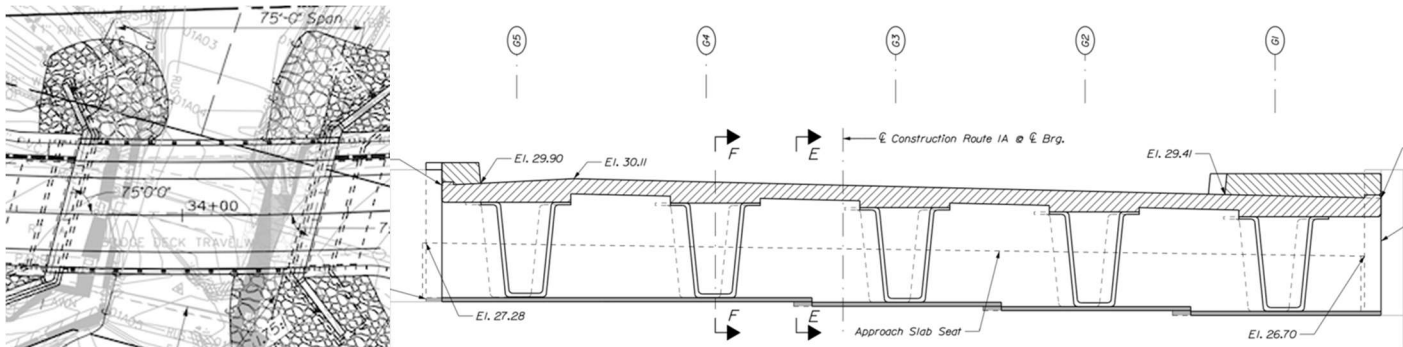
Layout and cross section of Grist Mill Bridge (Hampden, ME) (Source: MaineDOT)
